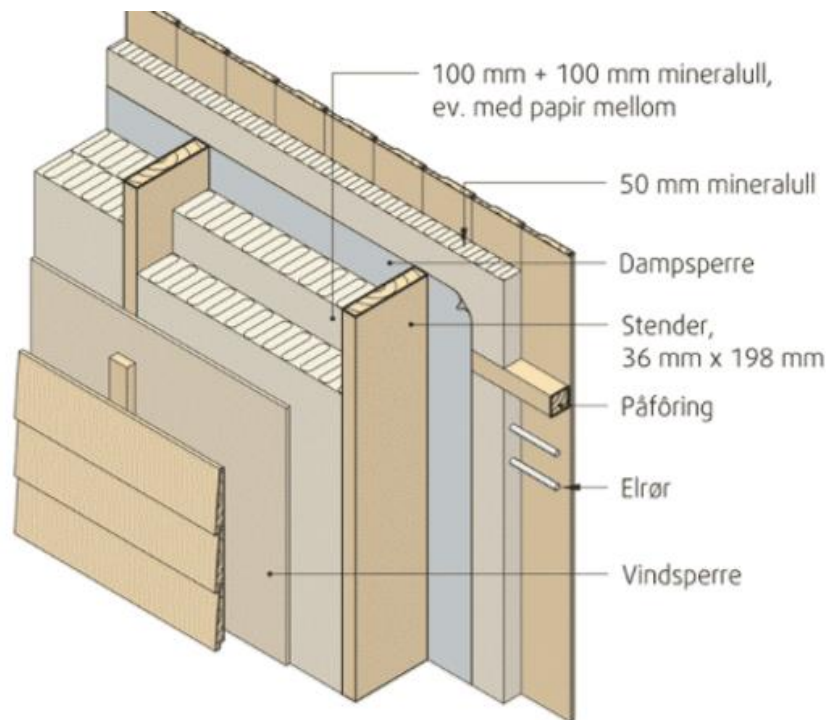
Outer wall with internal horizontal lining and retracted vapor barrier
